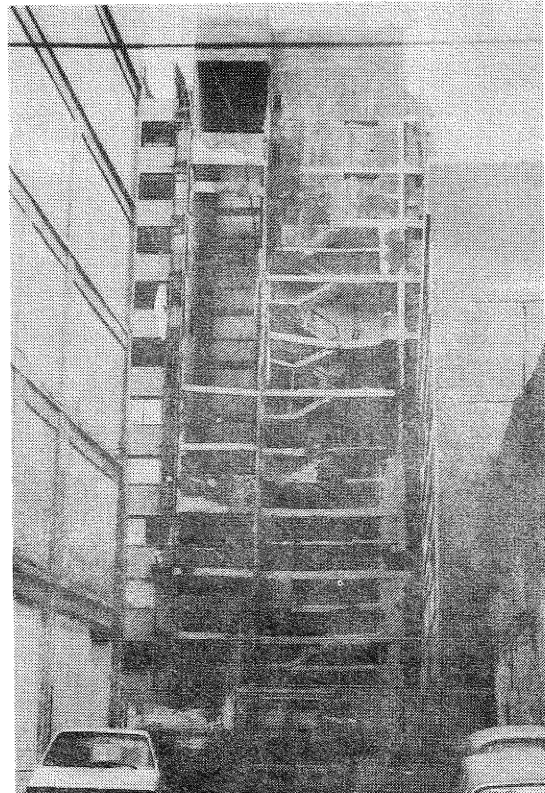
Damage to stair tower and hinging in strings due to non-separation.
